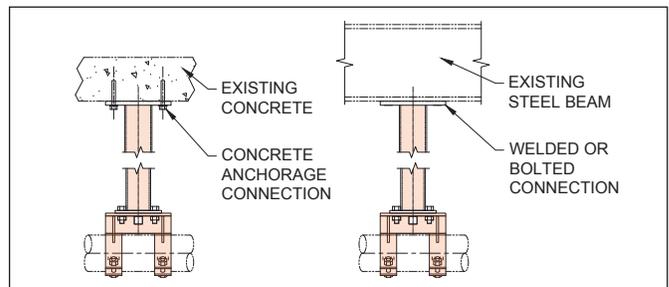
TYPICAL INSTALLATION OF PRODUCT A81/A82/A83 TO CONCRETE AND STEEL STRUCTURE
